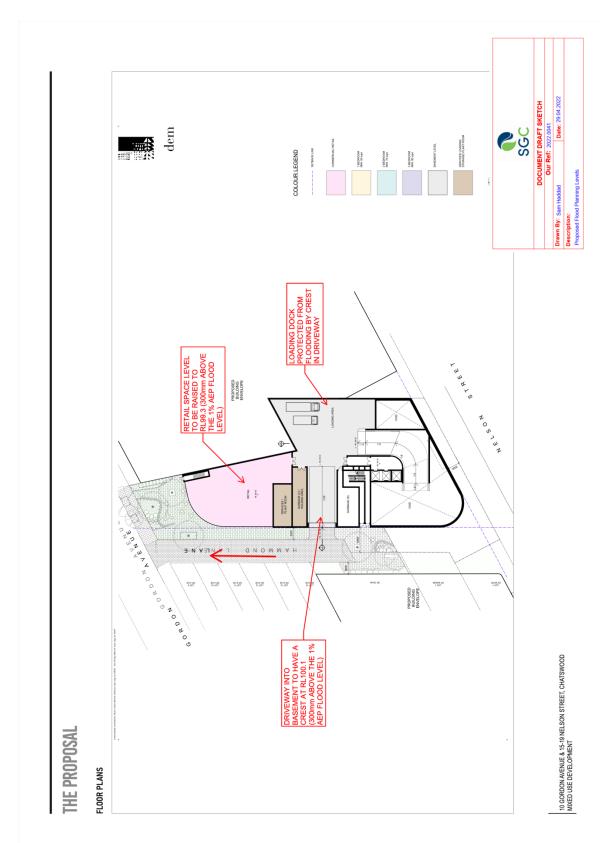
Proposed Flood Planning Levels – Lower Ground Floor
